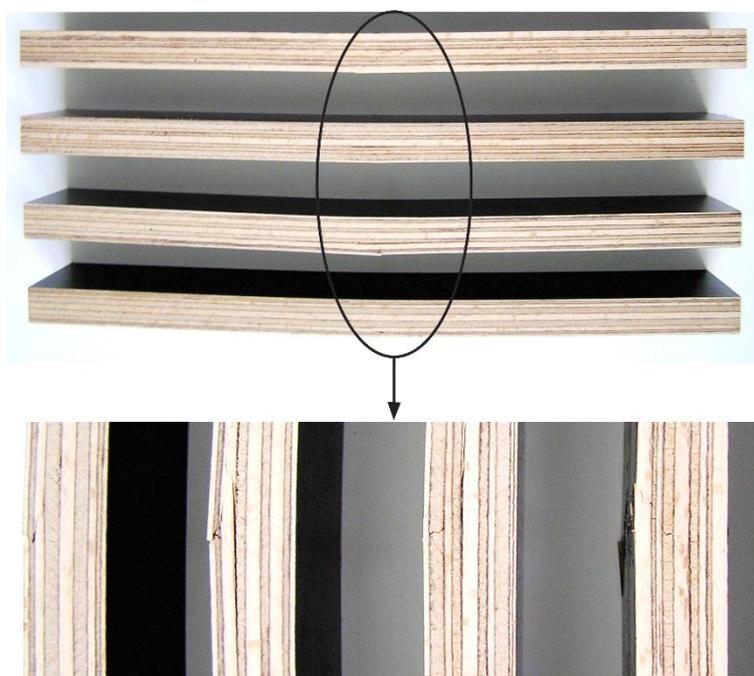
Failure mode of the test specimens of plywood models after bending test parallel to the face grain
